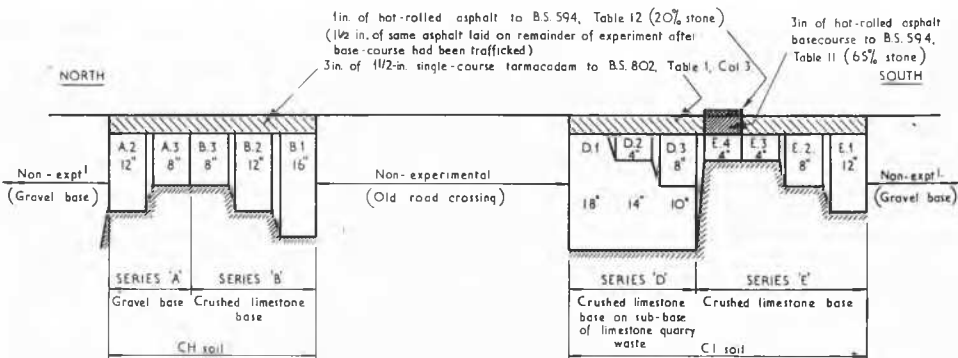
Layout of the experimental sections. Trunk road A 38.
